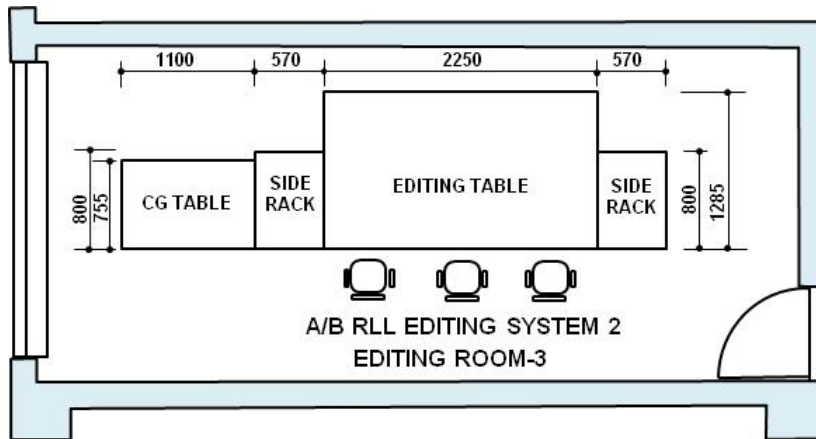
Equipment Arrangement of Editing Room-3
